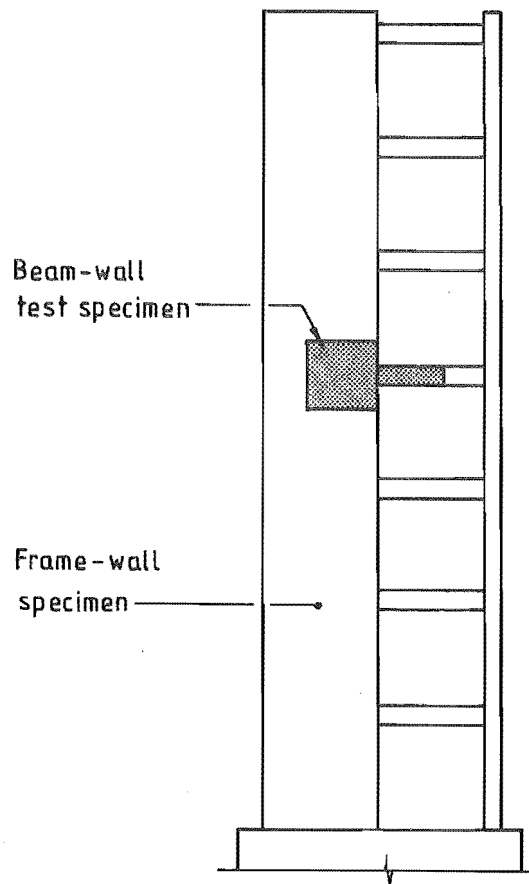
RELATIONSHIP BETWEEN BEAM-WALL AND FRAME-WALL SPECIMENS
